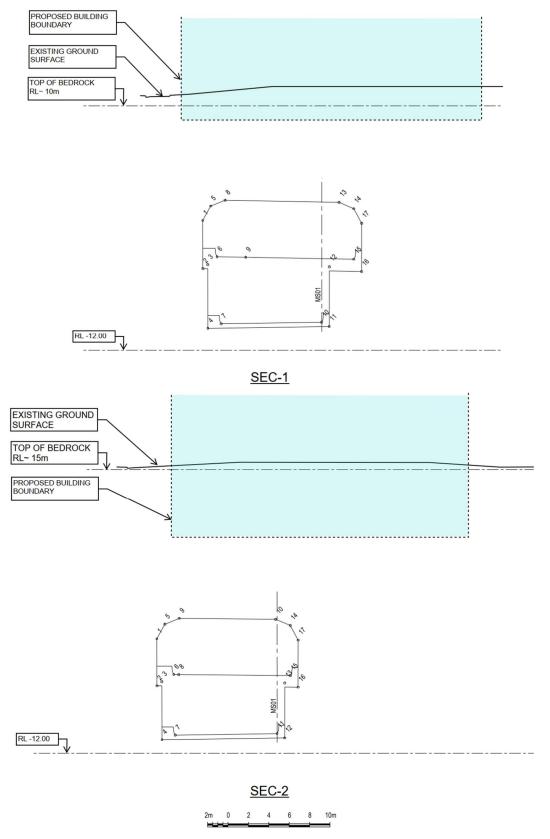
Site cross-sections showing the position of the ED tunnel with respect to the proposed development
